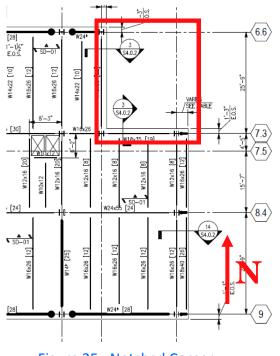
Notched Corner Drawing Courtesy of JCJ Architecture
